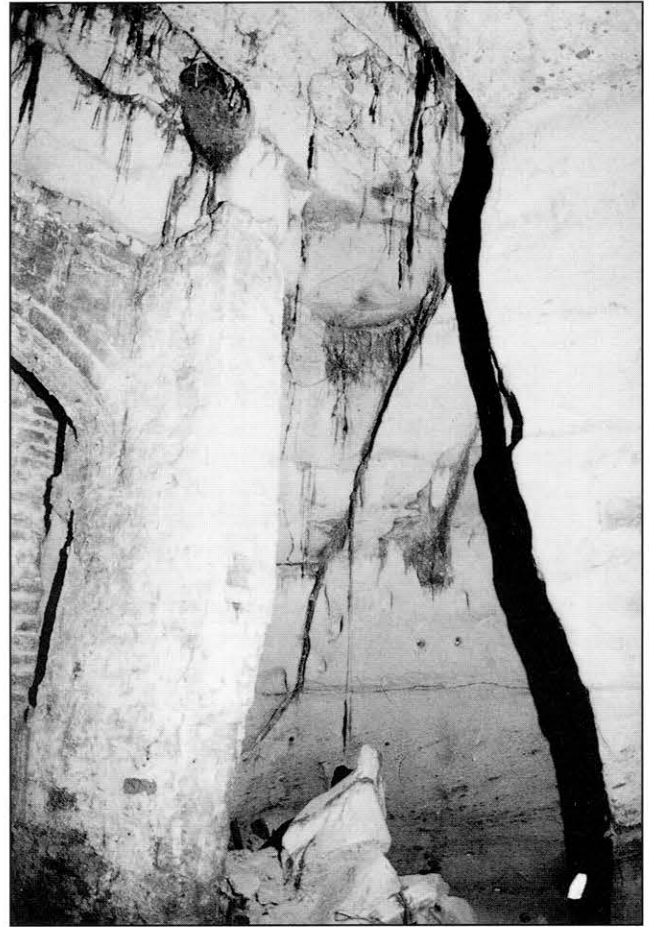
Interior of the cave beside Castle Road, with the fissure seen in Figure 4 descending diagonally towards the left. The fine tree roots which hang from many bedding planes and joints have caused the roof falls whose debris lies on the cave floor.
